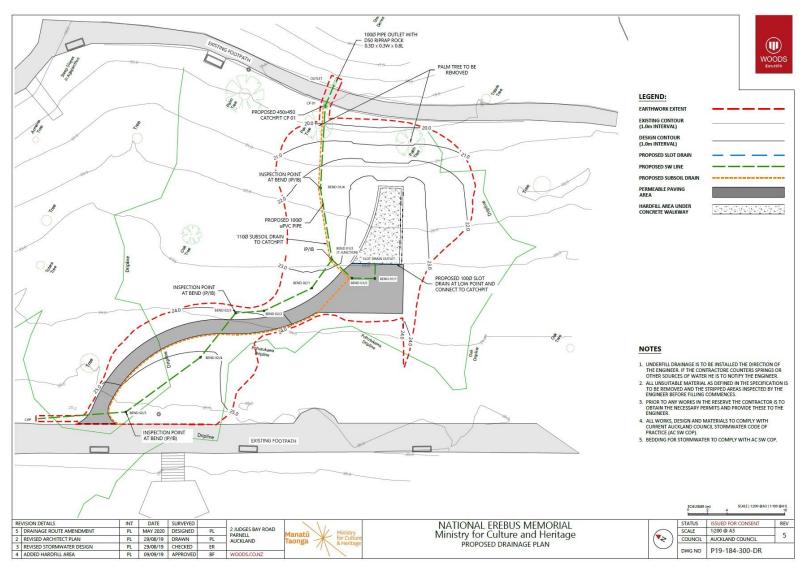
National Erebus Memorial – Proposed Drainage Plan (Woods, May 2020)
